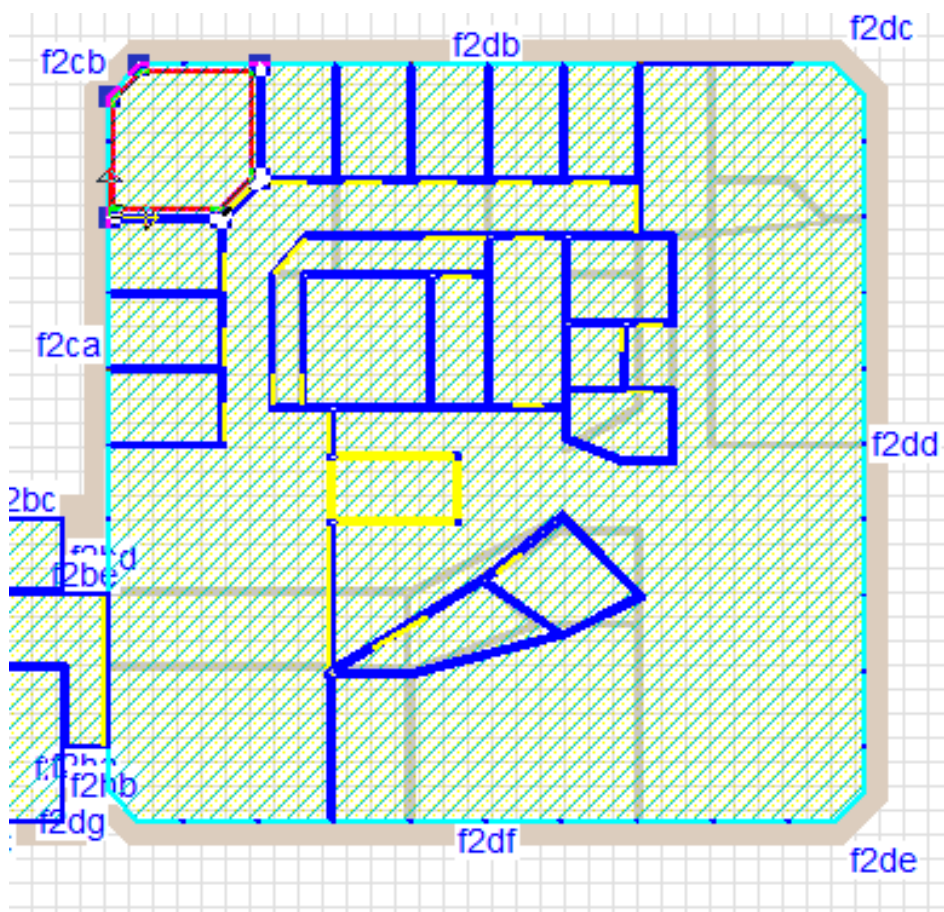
Location for Meeting room.4206 at the second floor in Building 4 from IDA ICE
